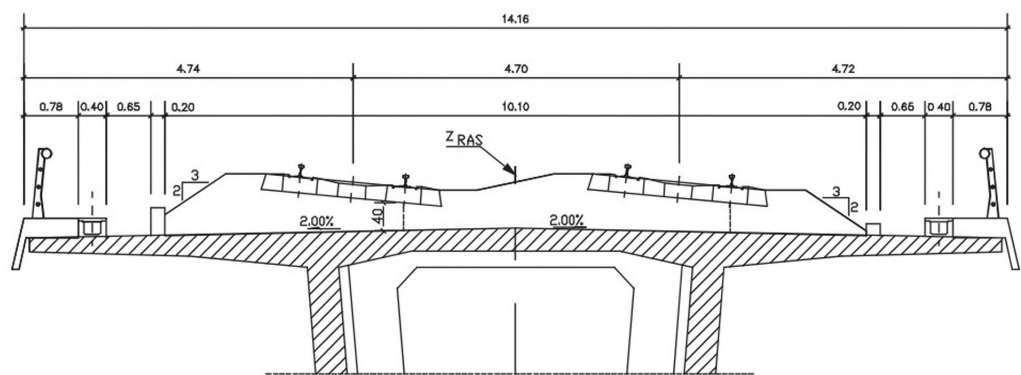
Typical platform and equipment for HSR Spanish bridges.
